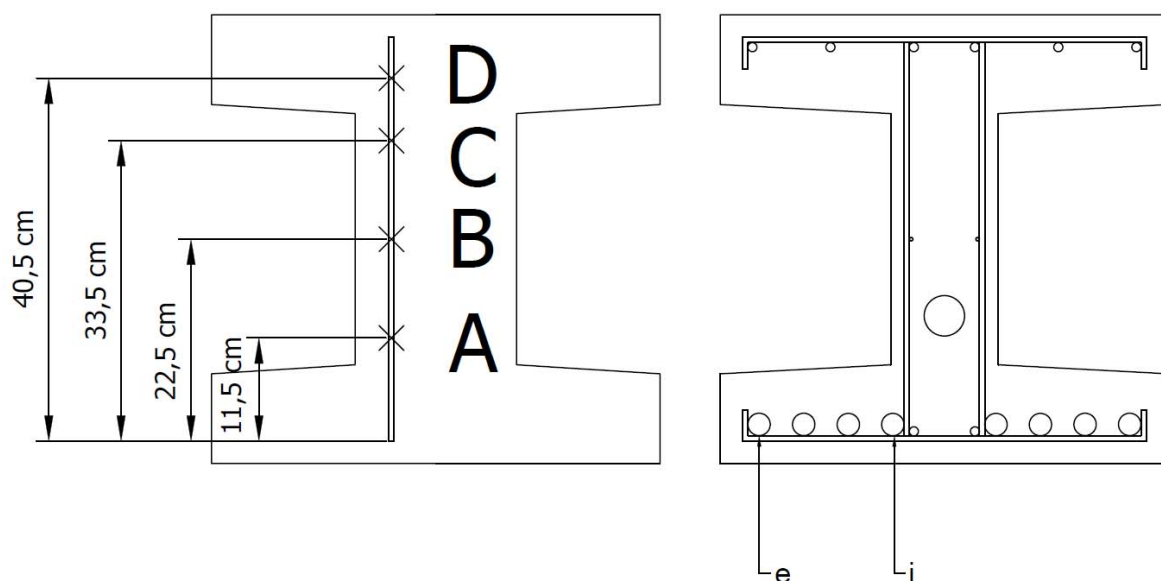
Strain Gauges position on the stirrups (left) and longitudinal reinforcement (right)
